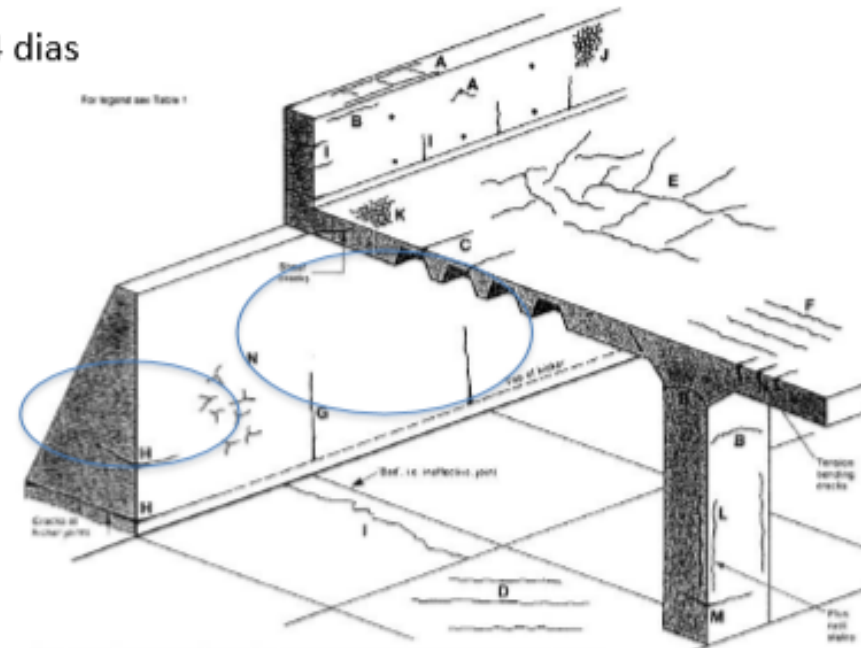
Examples of intrinsic cracks in hypothetical concrete structure
